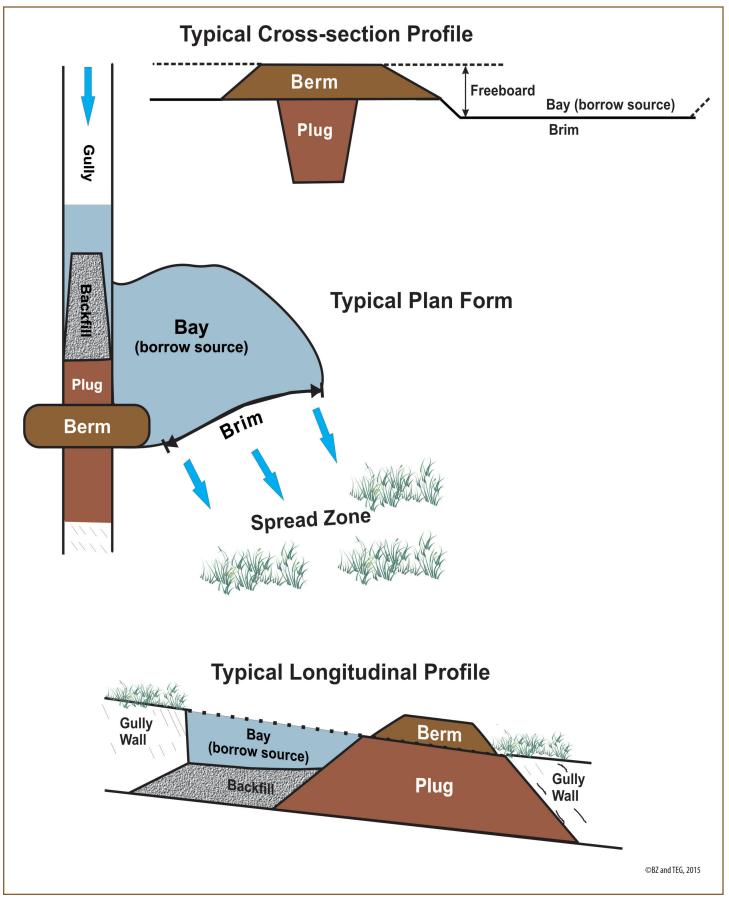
Schematic of a typical one-bay Plug and Spread structure in cross-section profile, plan form, and longitudinal profile.
